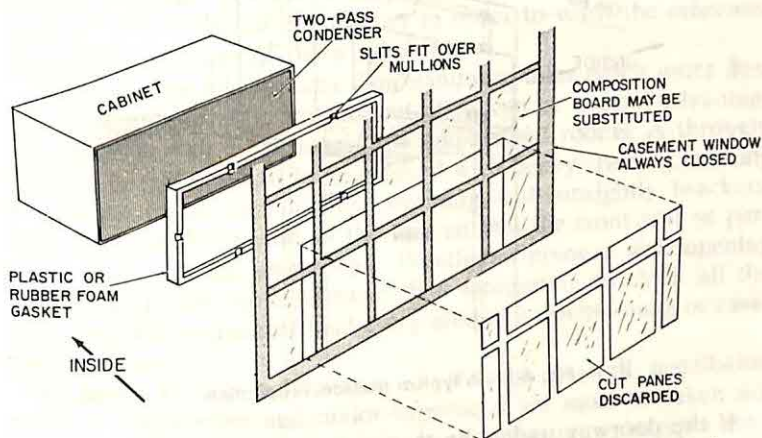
Cutting the glass panes for a wide casement-window installation.
